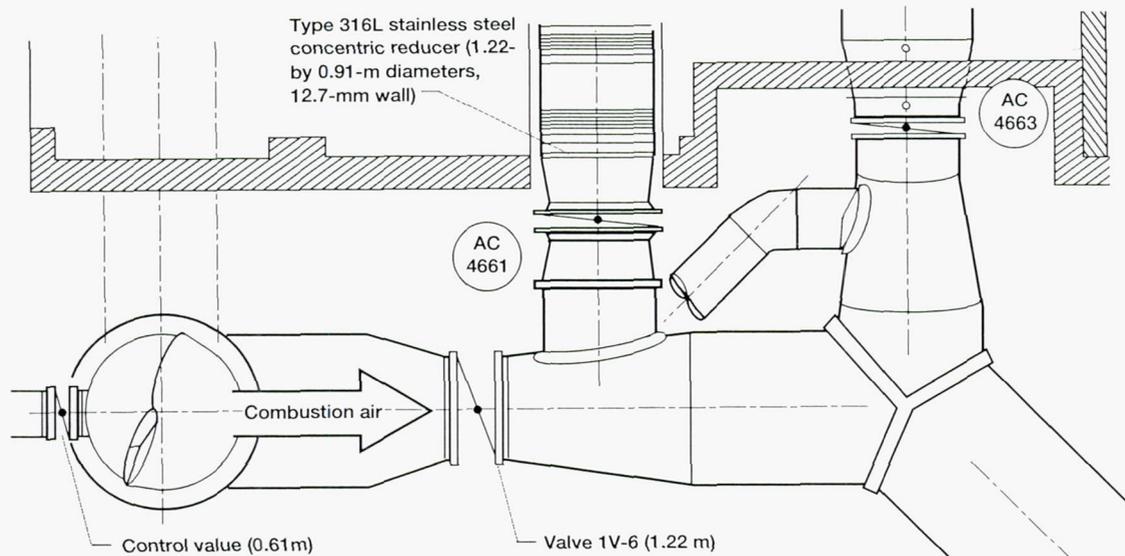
A portion of the plan drawing of the outdoor air supply system. Cracking occurred at valve 1V-6.
